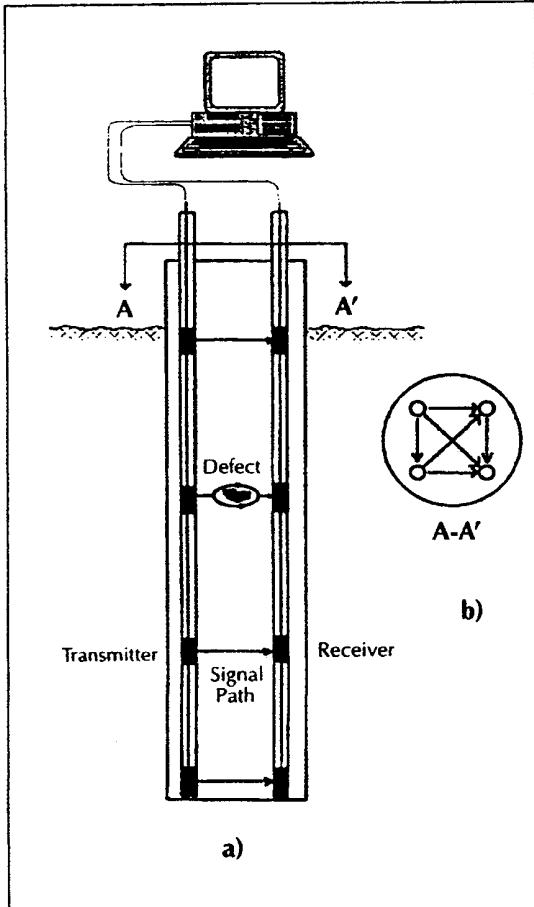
A typical crosshole sonic logging (CSL) test set-up showing a) the transmitter and receiver placed at different depths and b) a plan view of the CSL tubes noting possible test configurations.
